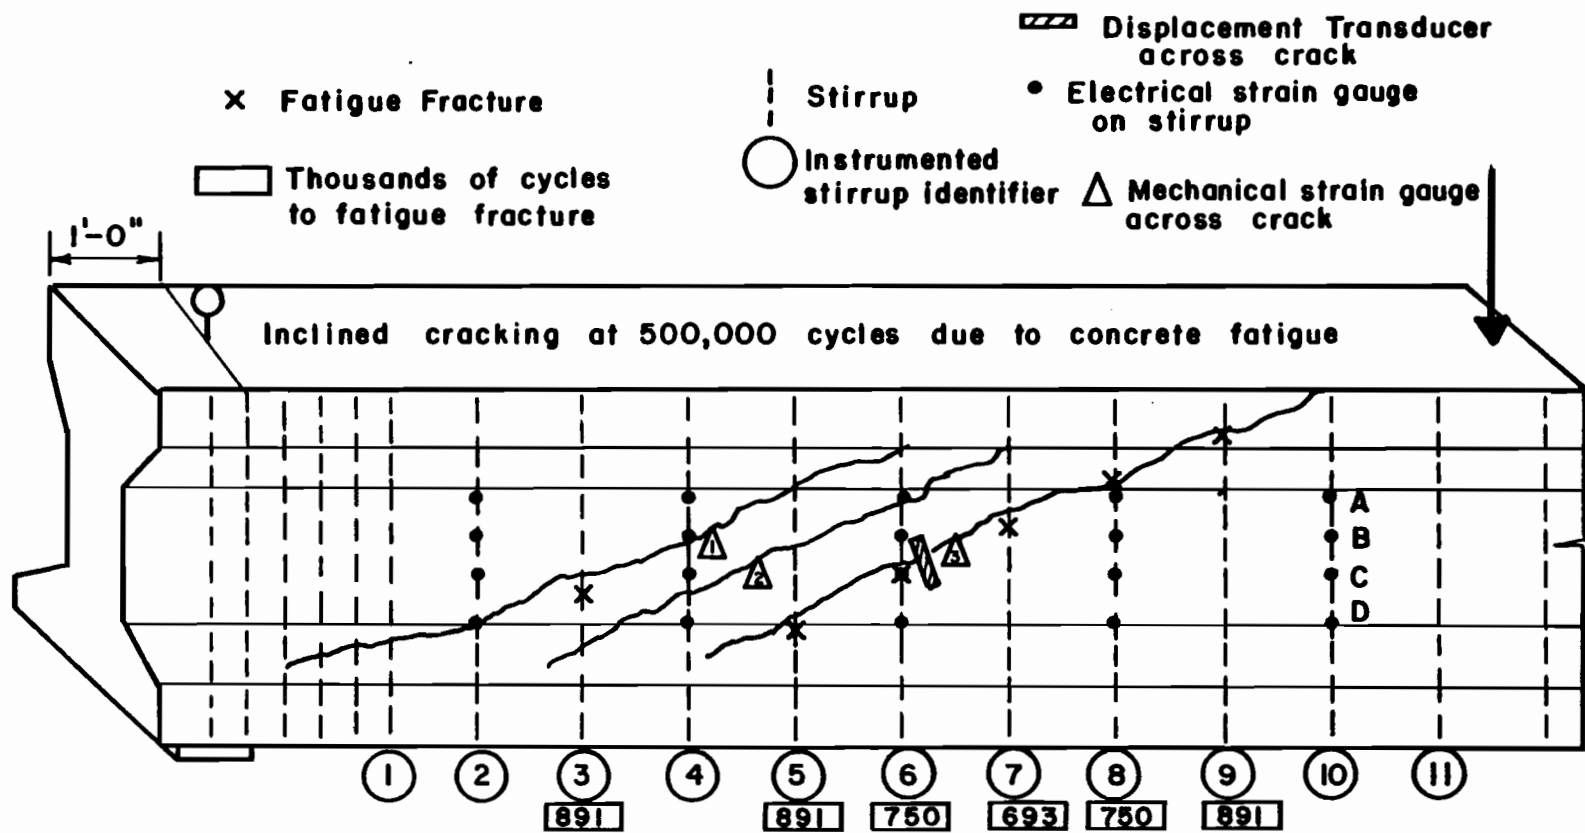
Beam 2, north shear span; instrumentation, crack pattern, and fatigue fractures
